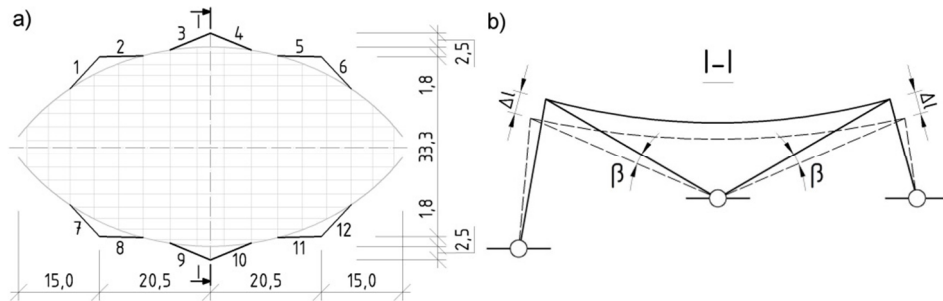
Views of the structure showing a) the arrangement of cable stays in plan and b) simplified static scheme in cross section considering 1<sup>st</sup> concept of indirect pretensioning
